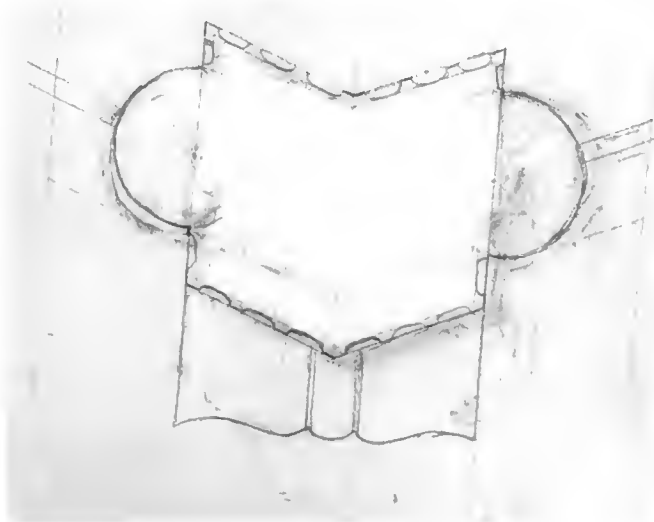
Sketch of a detail from Brunelleschi's Lantern of Santa Maria del Fiore (completed 1472). (Author).
